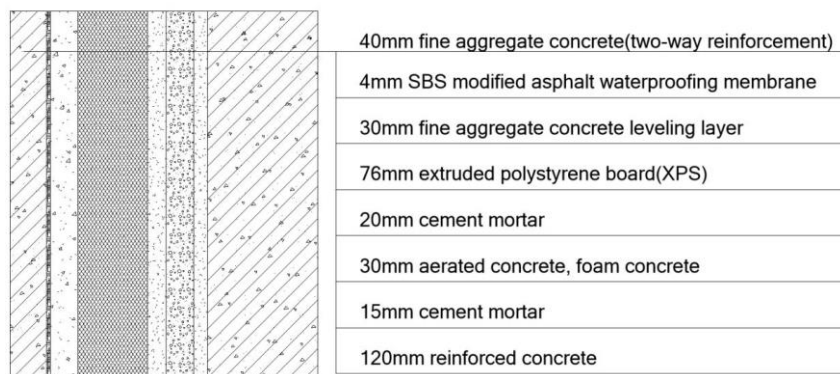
Exterior wall type (from outside to inside, made by the author)
